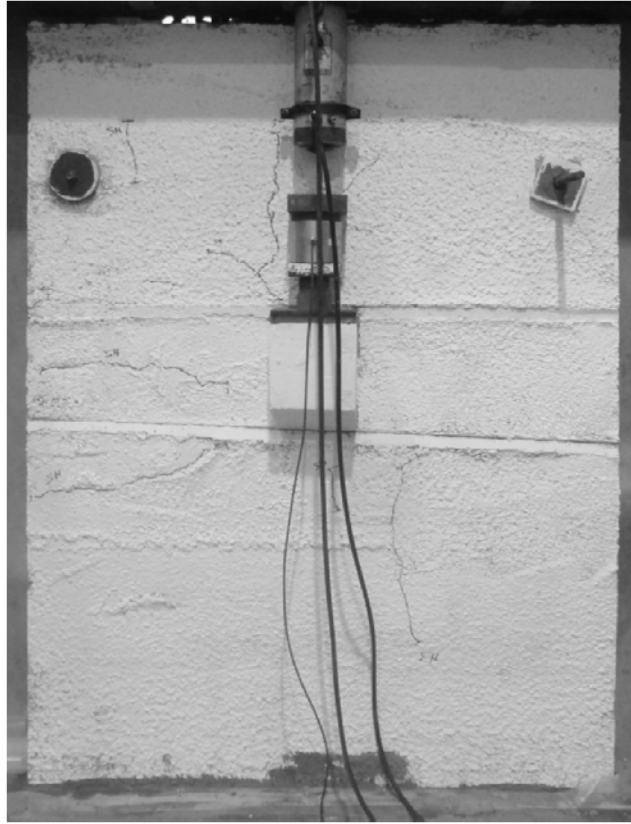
Marked plastic shrinkage cracks in specimen B1, prior to loading
